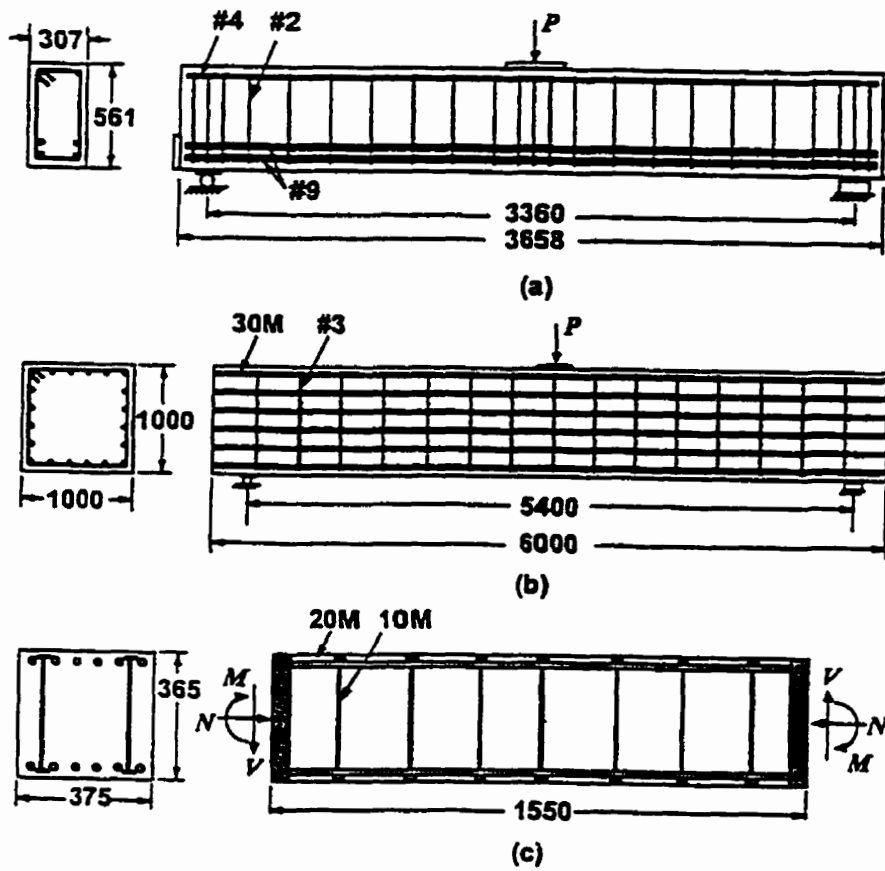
Details of test beams. (a) Bresler-Scordelis beams (b) Podgorniak-Stanik beams (c) Gupta Beams
